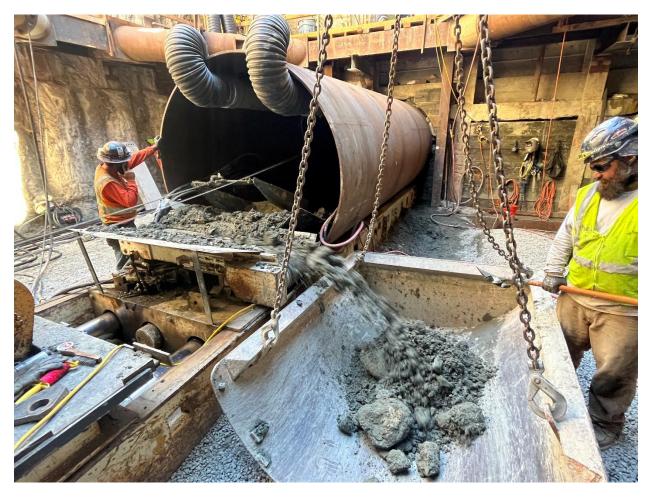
Tunneling through the ground 45-feet below the ground surface of the water treatment plant. Mine tailings being ejected out of the end of the 90-inch steel tunnel casing for installation of the steel pipeline from the filter Effluent pipelines.
